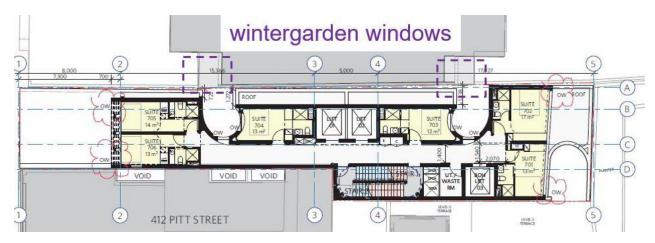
Typical floor plan levels 7 to 29 with location of wintergarden windows on adjoining building dashed
